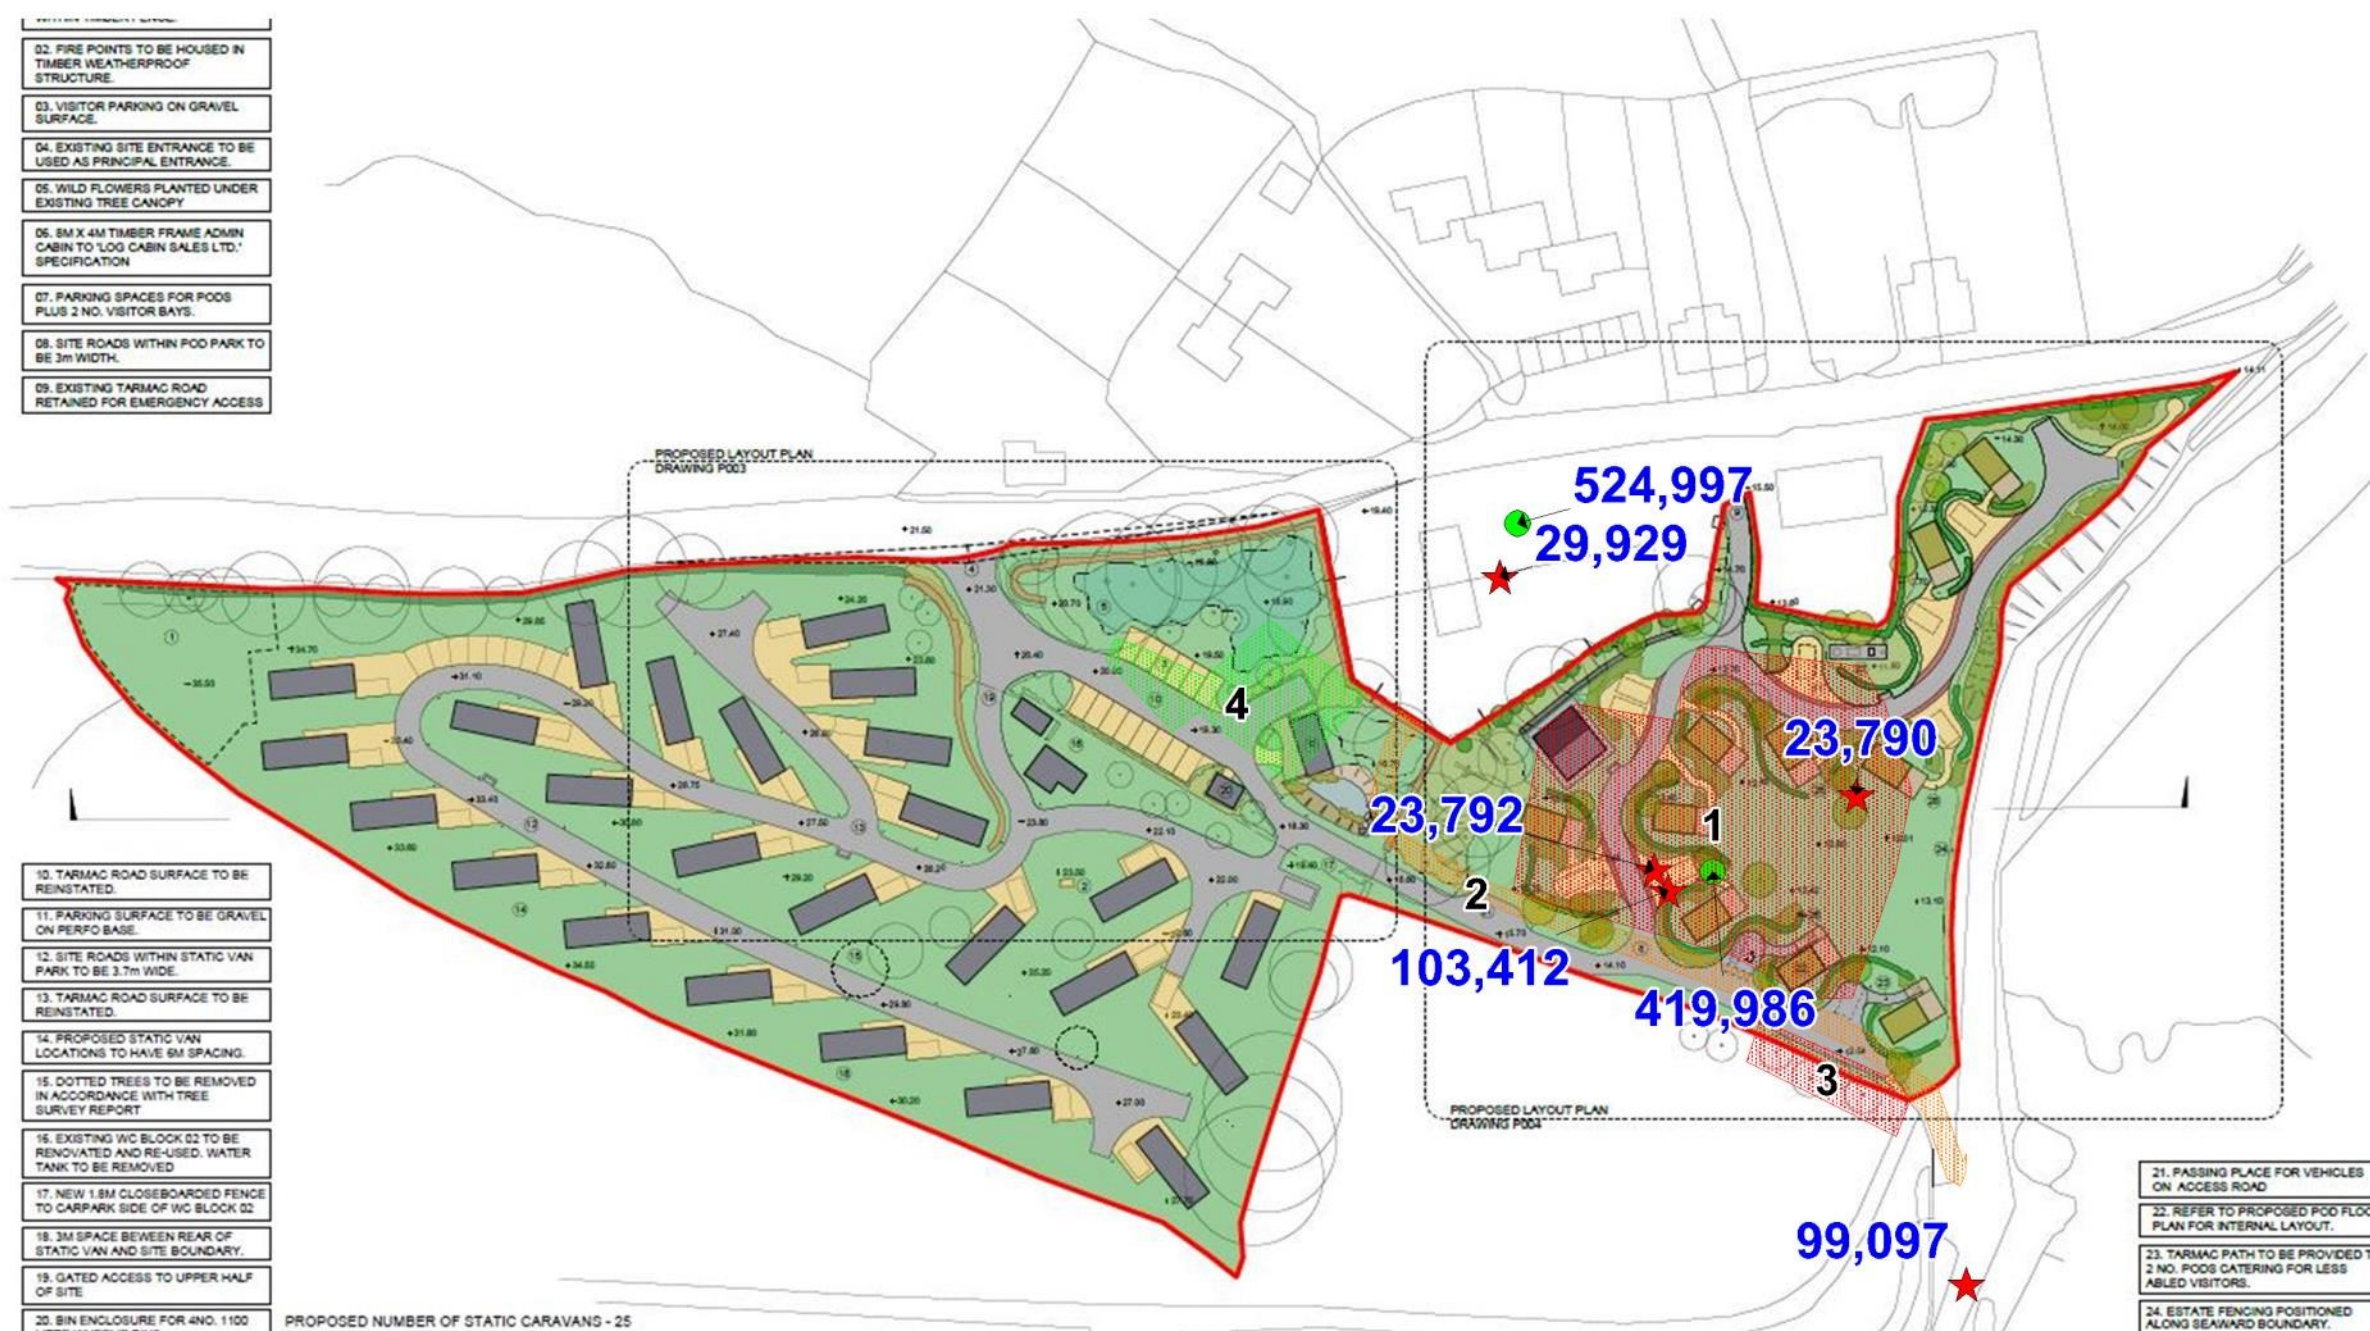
Areas of buried archaeological potential superimposed over the proposed development plans. Areas of High potential are shaded red; Medium potential are shaded amber and Low potential are shaded in green. (Development plans © Acanthus Holden Architects).
